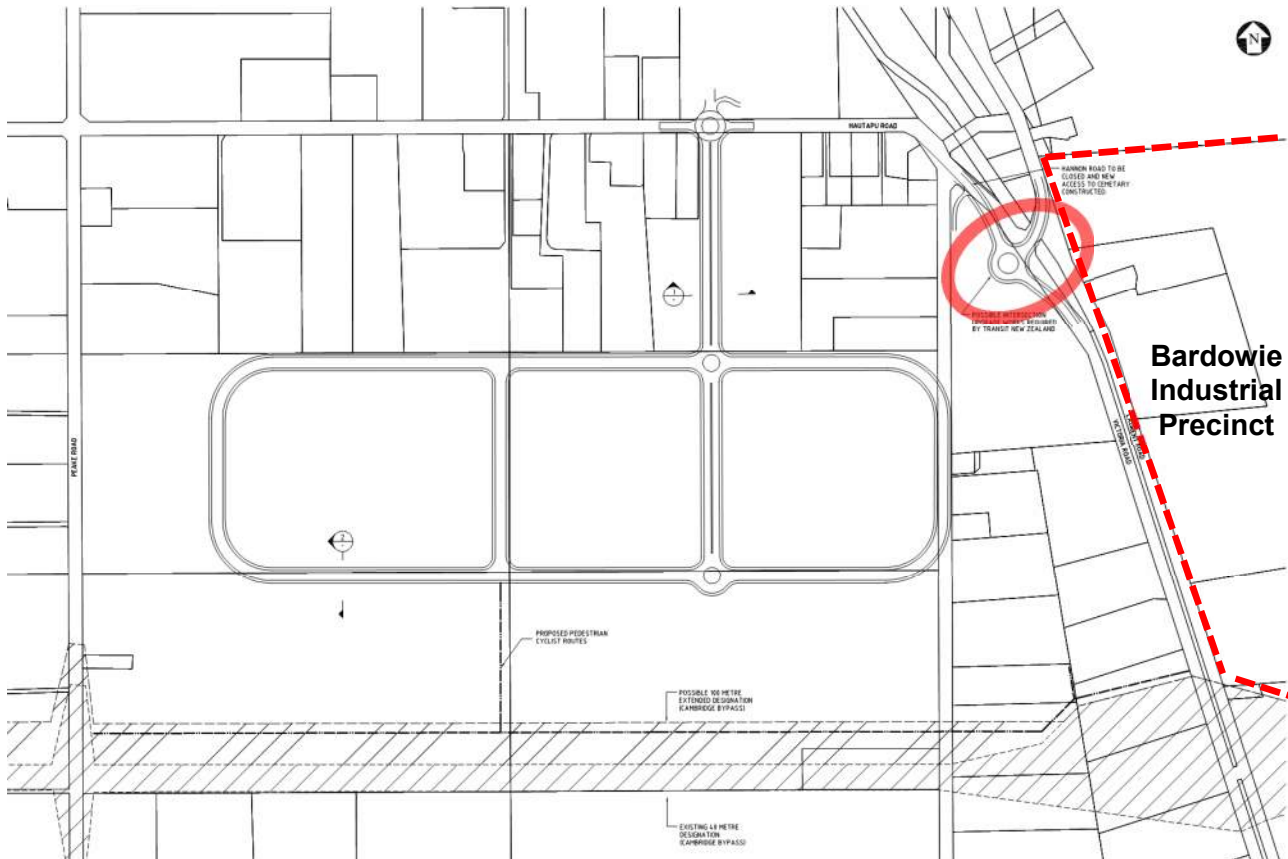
Hautapu Structure Plan Roading Layout (Beca) - showing future Victoria Road intersection
